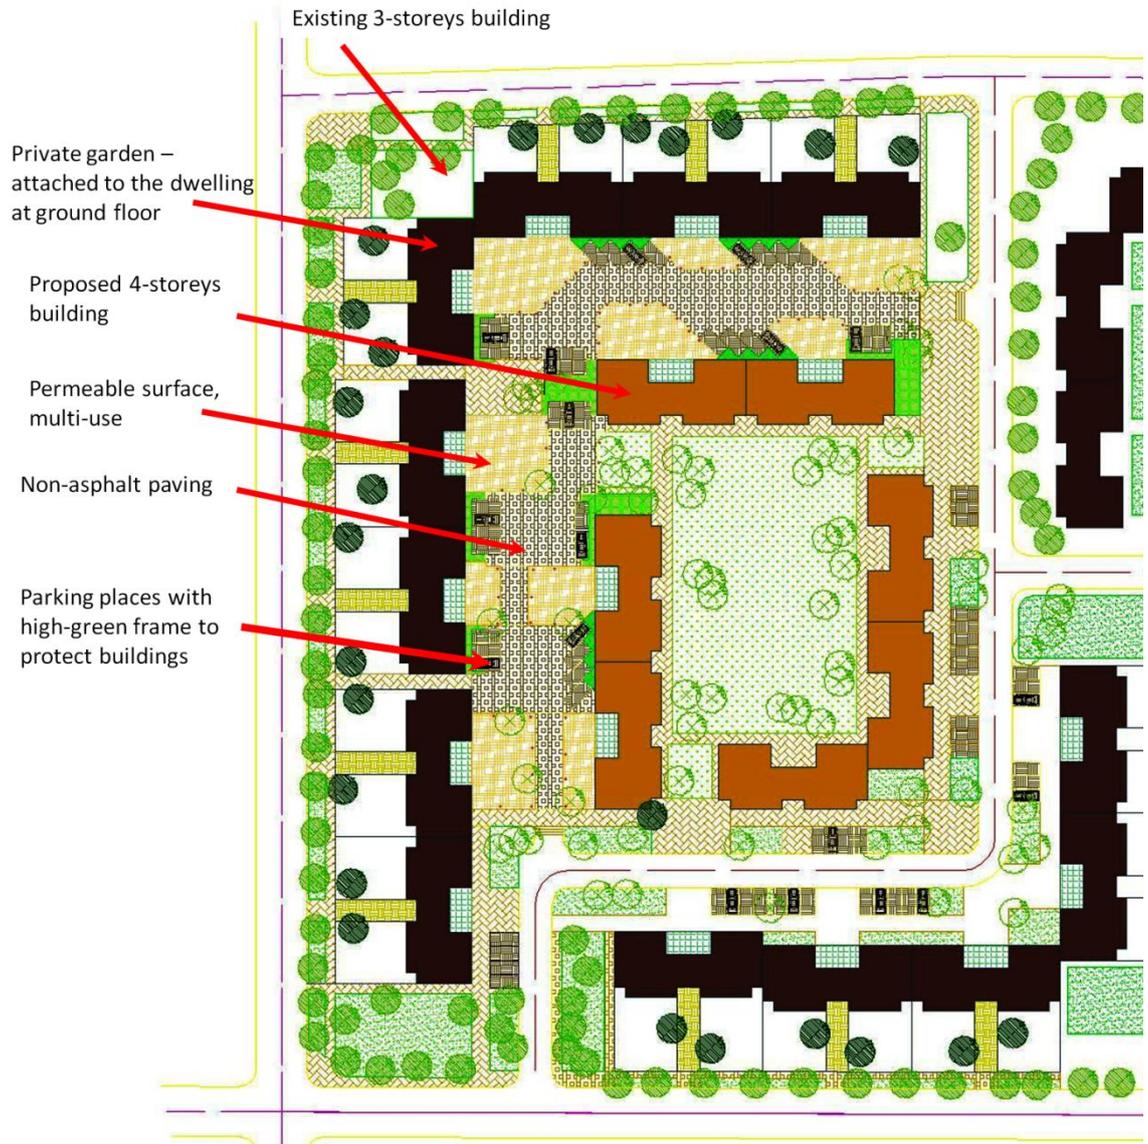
15: Detailed Plan - Proposed Scheme, Ben-Talb Area
